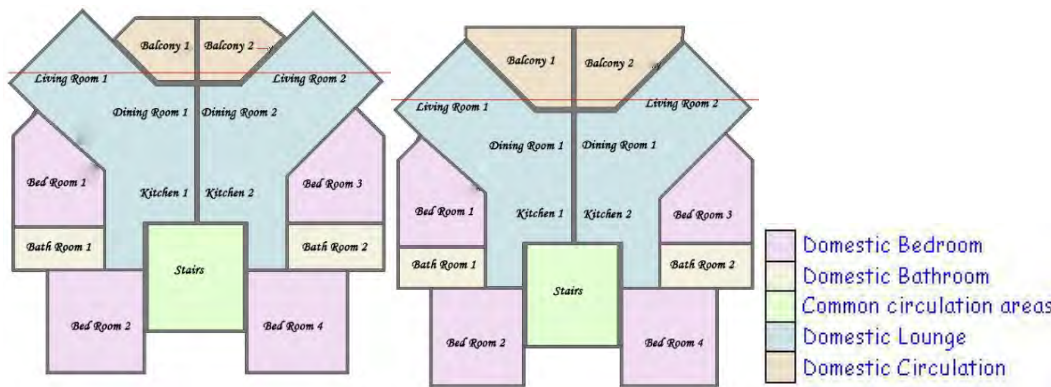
Building Outline (Ground Floor plan, First Floor plan).
